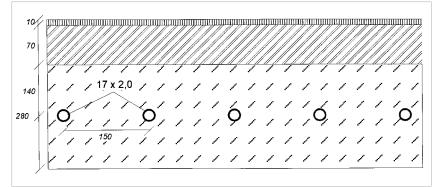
Ceiling structure concrete core temperature control cross section
